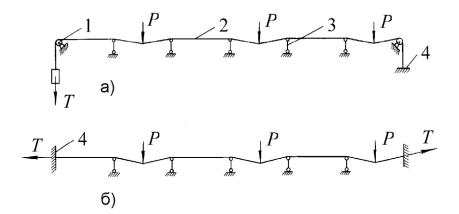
String linear scheme: a) with a block at the end of a string; b) with a string sealed off; 1 — block; 2 — string; 3 — swing support; 4 — fixing (anchor).
